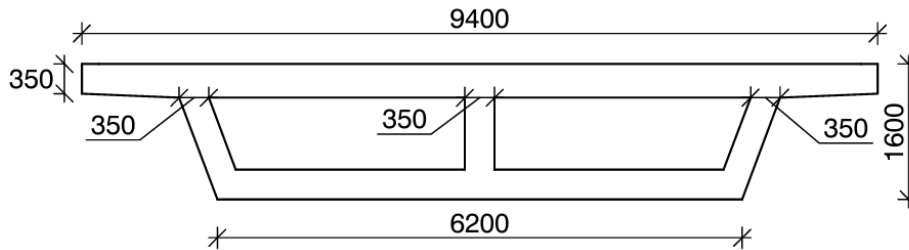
Details of post-tensioned concrete box girder segments (mm).
